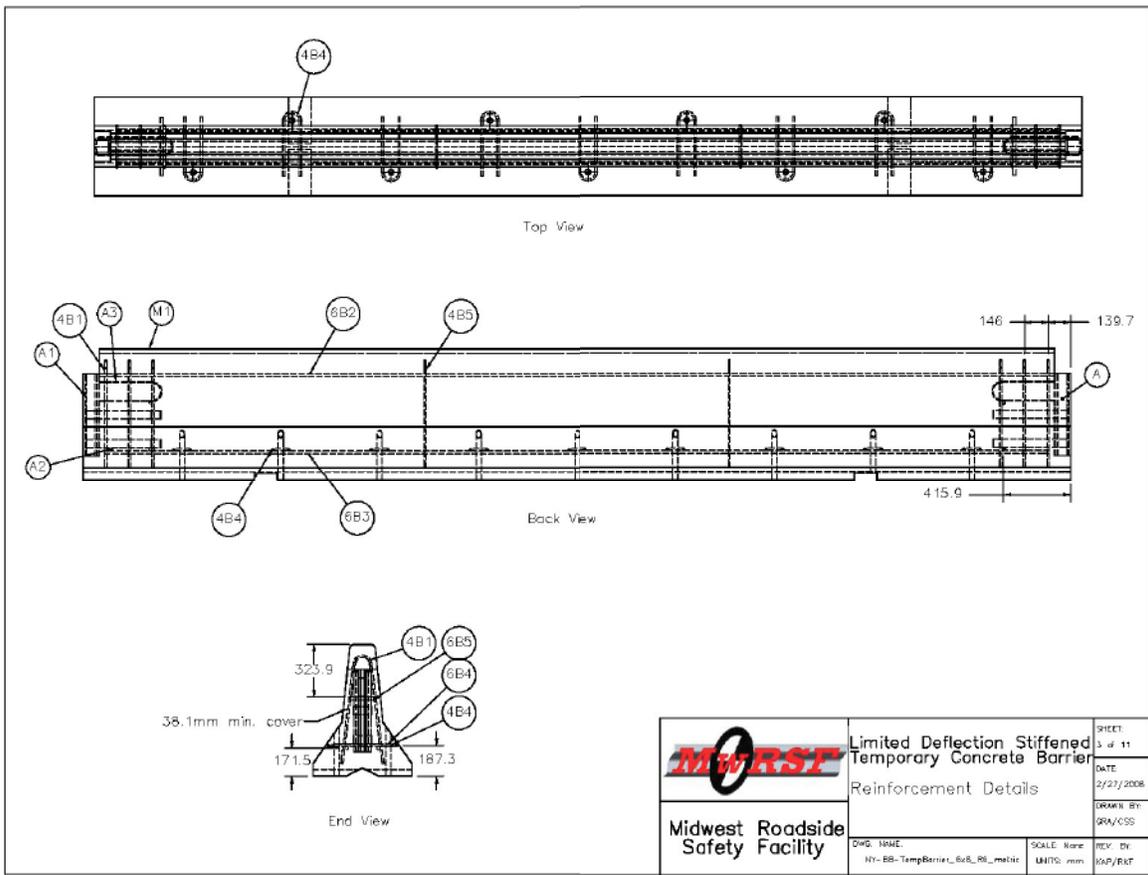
Temporary Concrete Barrier Reinforcement Details, Test NYTCB-3
